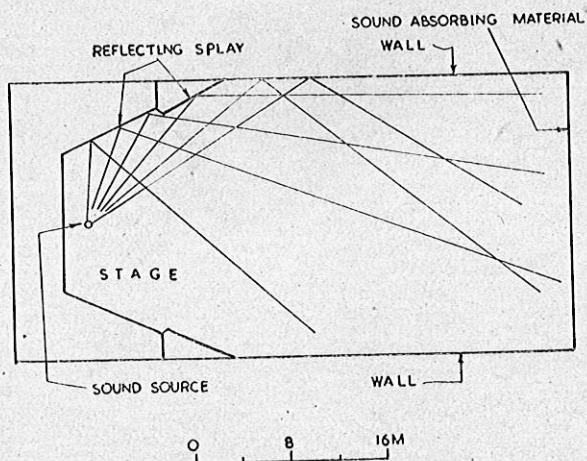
Plan of rectangular hall showing useful reflections from the wall splays, and stage insets.
